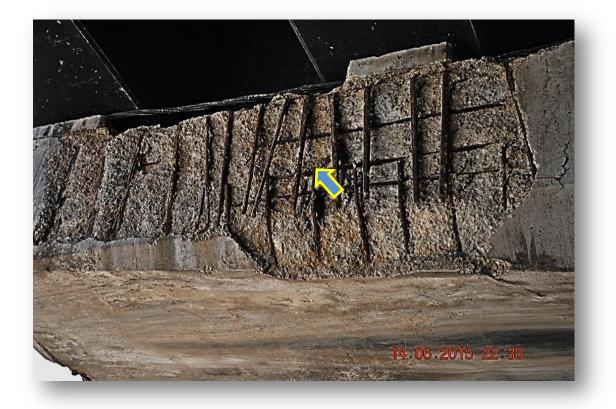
Concrete delamination and exposure of Reinforcement in pier Capital due to heavy traffic loads & low strength of concrete cover.
